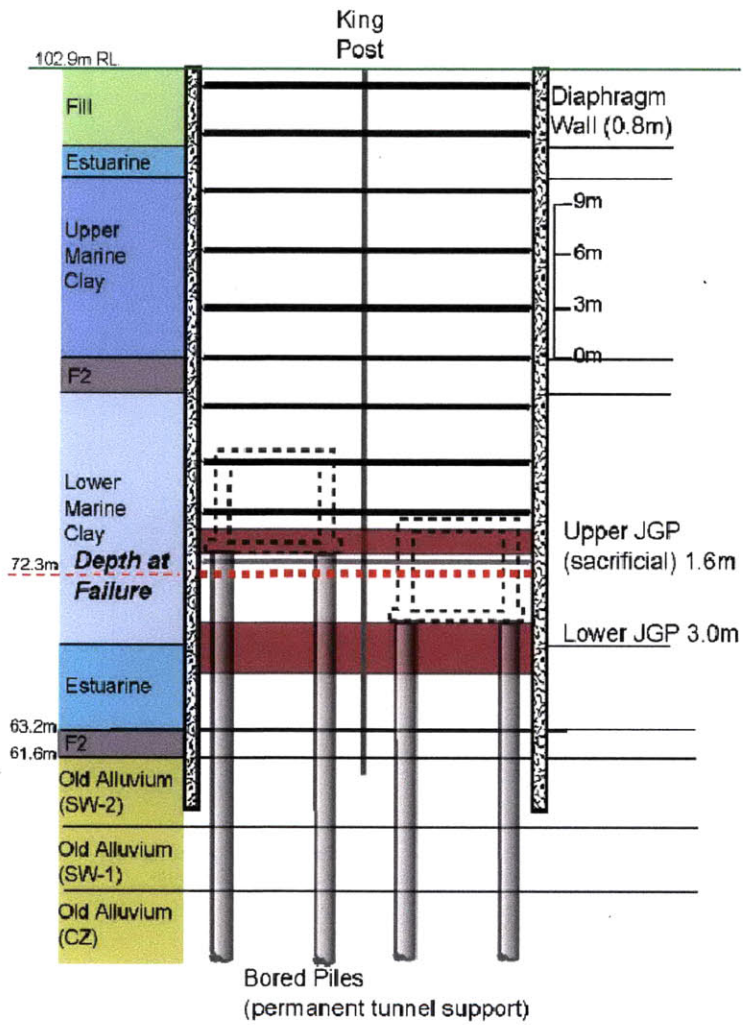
M3 typical design cross-section of excavation support system (Whittle and Davies, 2006)
